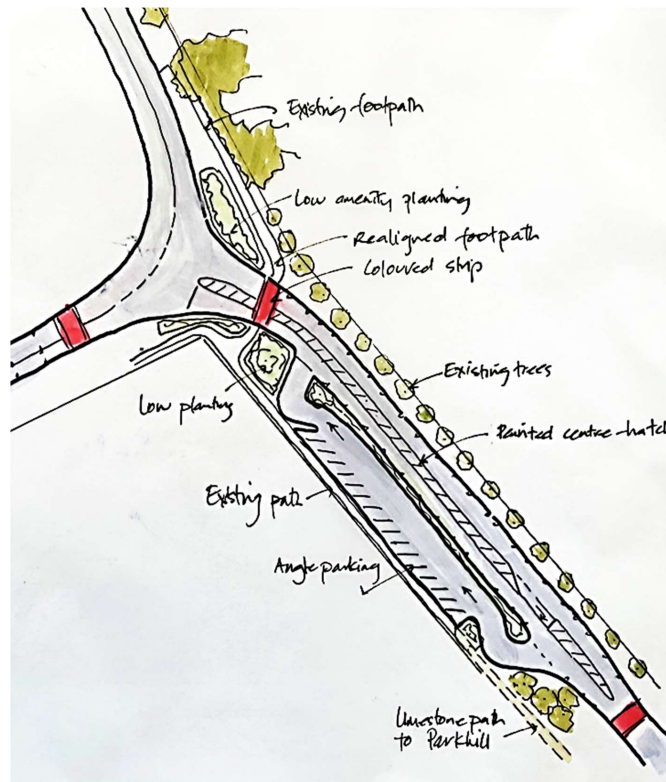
Proposed indicative layout for the Parkhill Road/Raymond Road intersection
